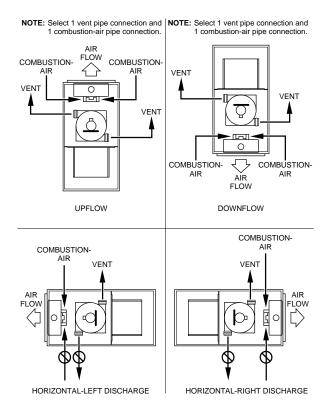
Combustion-Air and Vent Pipe A96187 Connections
